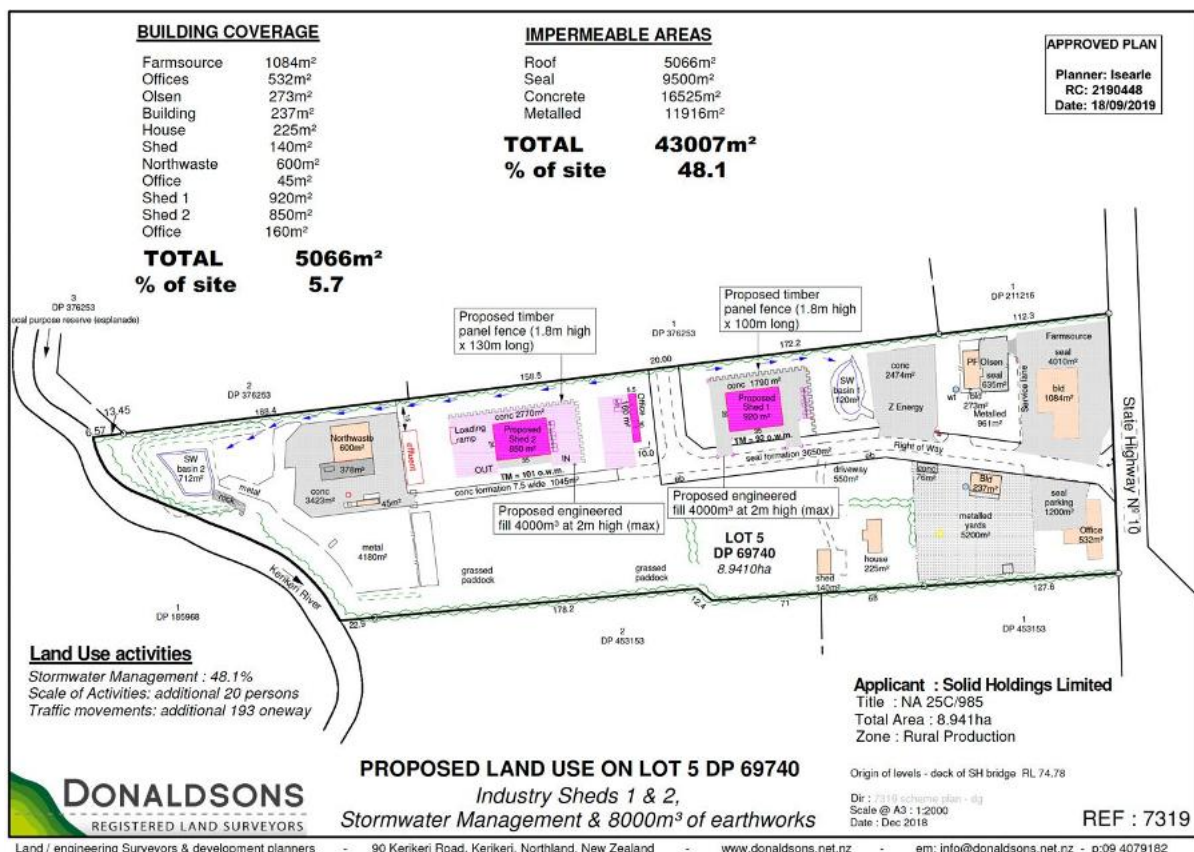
RC2190448 Approved Plan showing proposed sheds on L2 and L3 [Source: Donaldsons]
